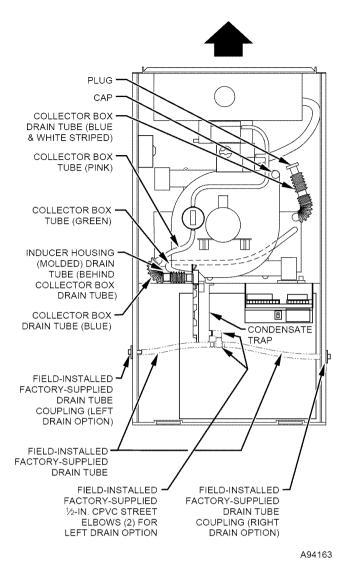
Factory-Shipped Upflow Tube Configuration (Shown with Blower Access Panel Removed)
